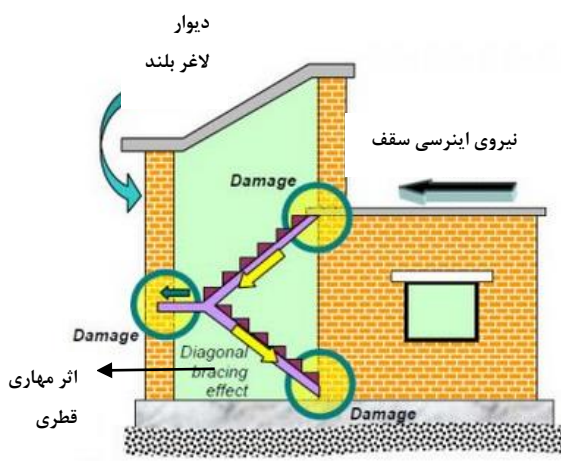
Damage in building with rigidly built-in staircase
